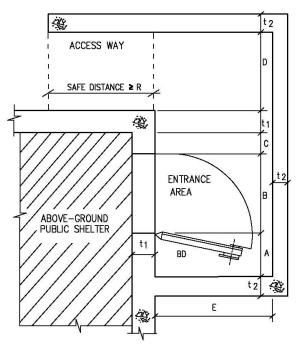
Plan - Typical Layout Of An Entrance Area To An Above-Ground Public Shelter (Possibility A)
